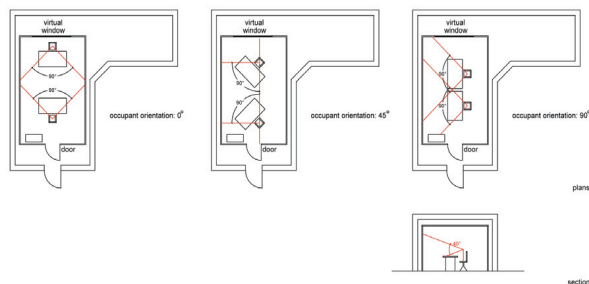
The occupant orientation as 0°, 45° and 90° with the field of views shown on plan and section of the test room.
